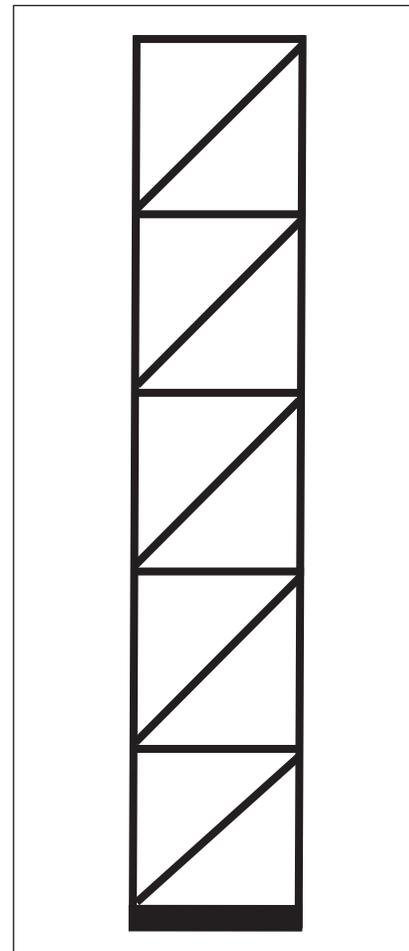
Diagram shows the location of columns, floor plates, and the foundation.
